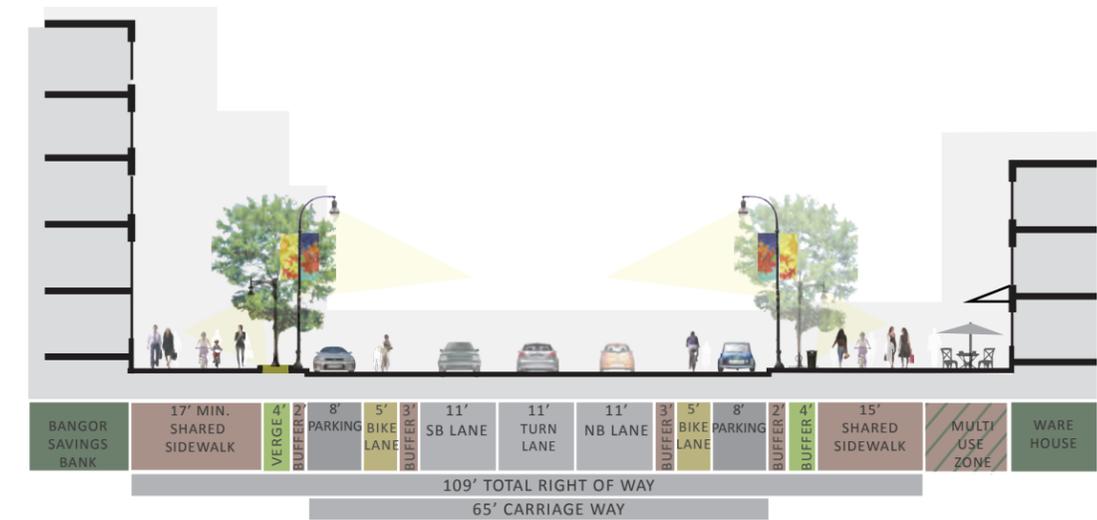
Section DD' Through Franklin Street Near Fore St. Looking North
